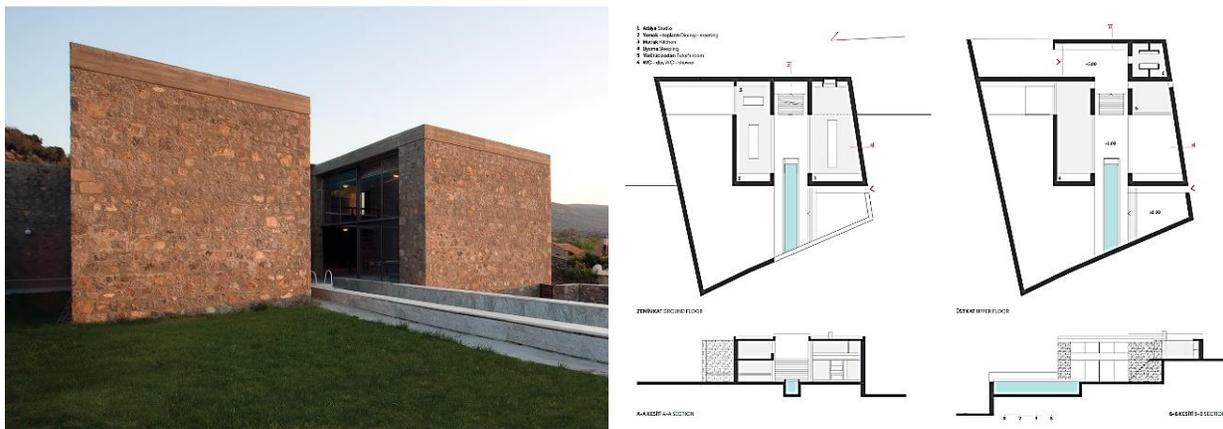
Inward-oriented transparent facade and plans of Emre Senan House in Yahşibey [58].
